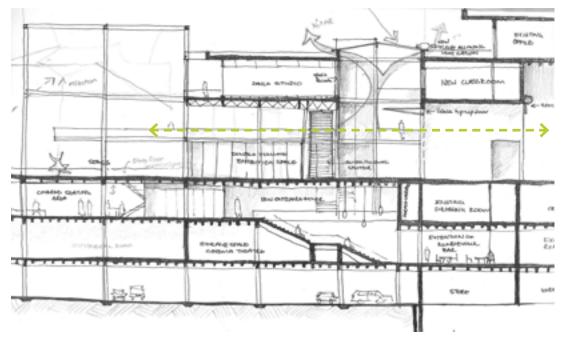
Concept Section through stage area indicating movement to existing side stage
